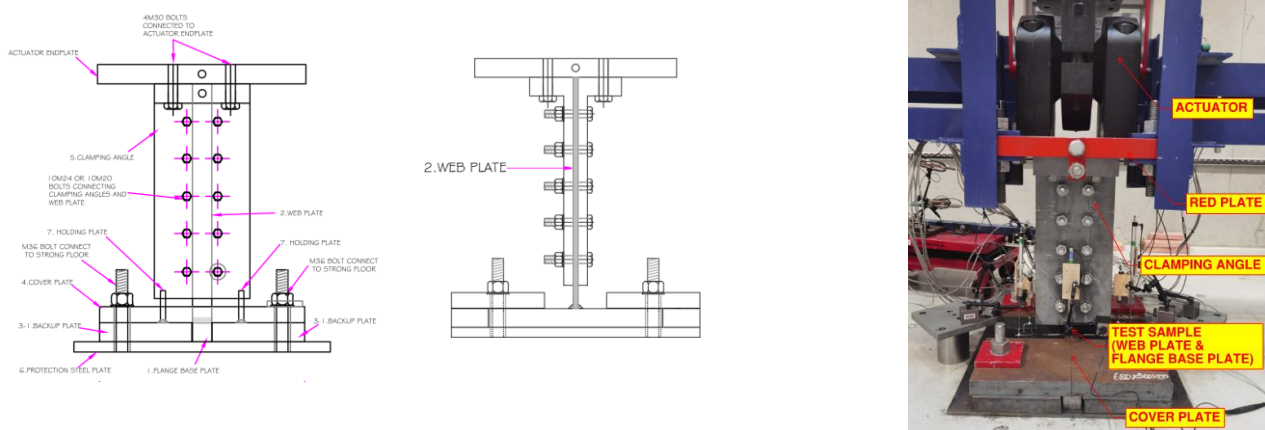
the test setup: drawings of two side views (left) and actual setup (right)
